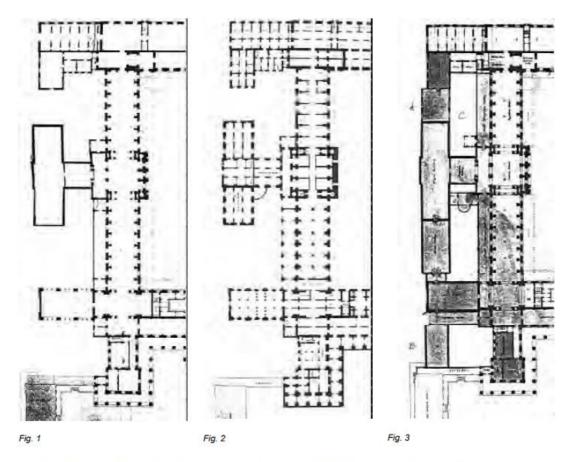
The East Wing, as proposed 1827, Level 1 (BM Plans 56), Fig. 2 The East Wing, as proposed, 1827, Level 2 (BM Plans 57) The East Wing, as proposed, 1827, Level 6 (BM PLANS 55)
